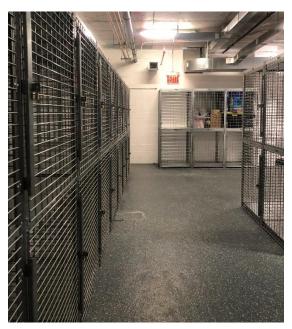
View of concrete floor in hallway of the West Tower. Dated 12/20/2018.
